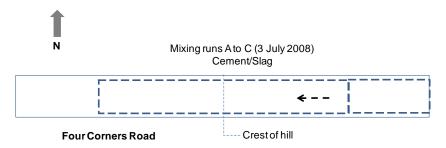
View of mixing runs for Four Corners Road, Jerilderie.
